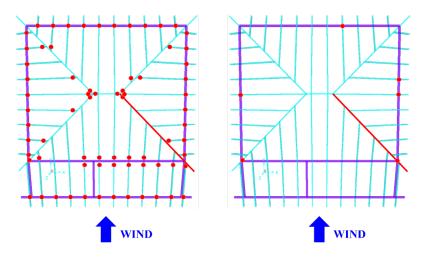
Plan view of roof structure and perimeter wall plates in SAP2000. a) Rafter-to-rafter / ridge board and rafter-to-wall plate connections highlighted where nail pull-out capacity is exceeded. b) Nail pullover capacity exceedance highlighted. Analysis considers wind loading at a max. 3-s gust wind speed of up to 75m/s at 10m height
